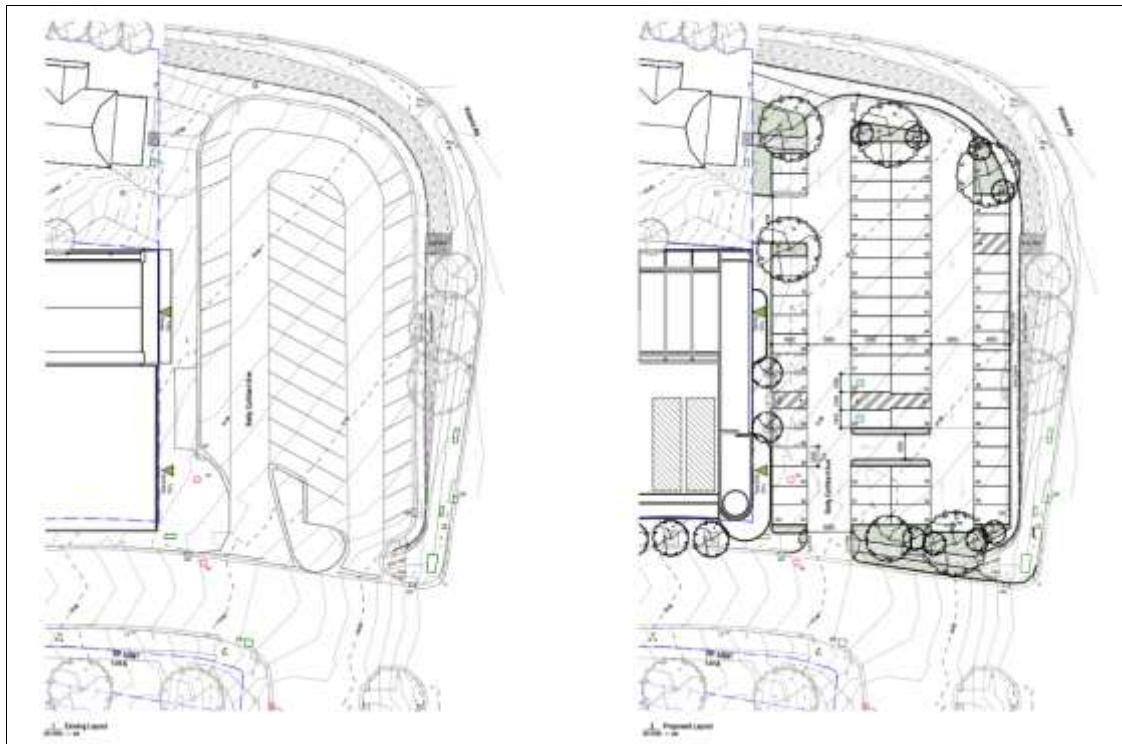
Betty Cuthbert car park (existing and proposed layout).
